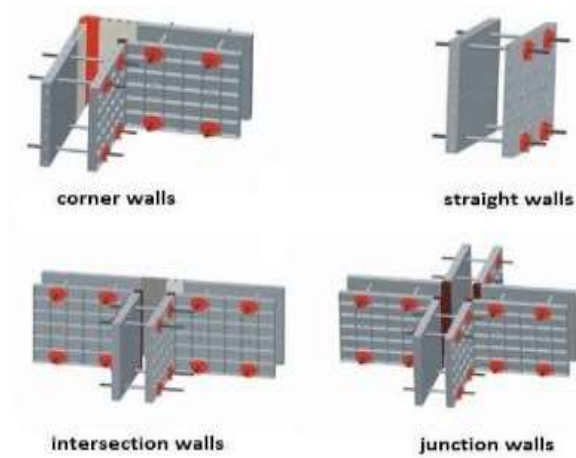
SISCON PLASTIC FORMWORK FOR RCC WALLS
